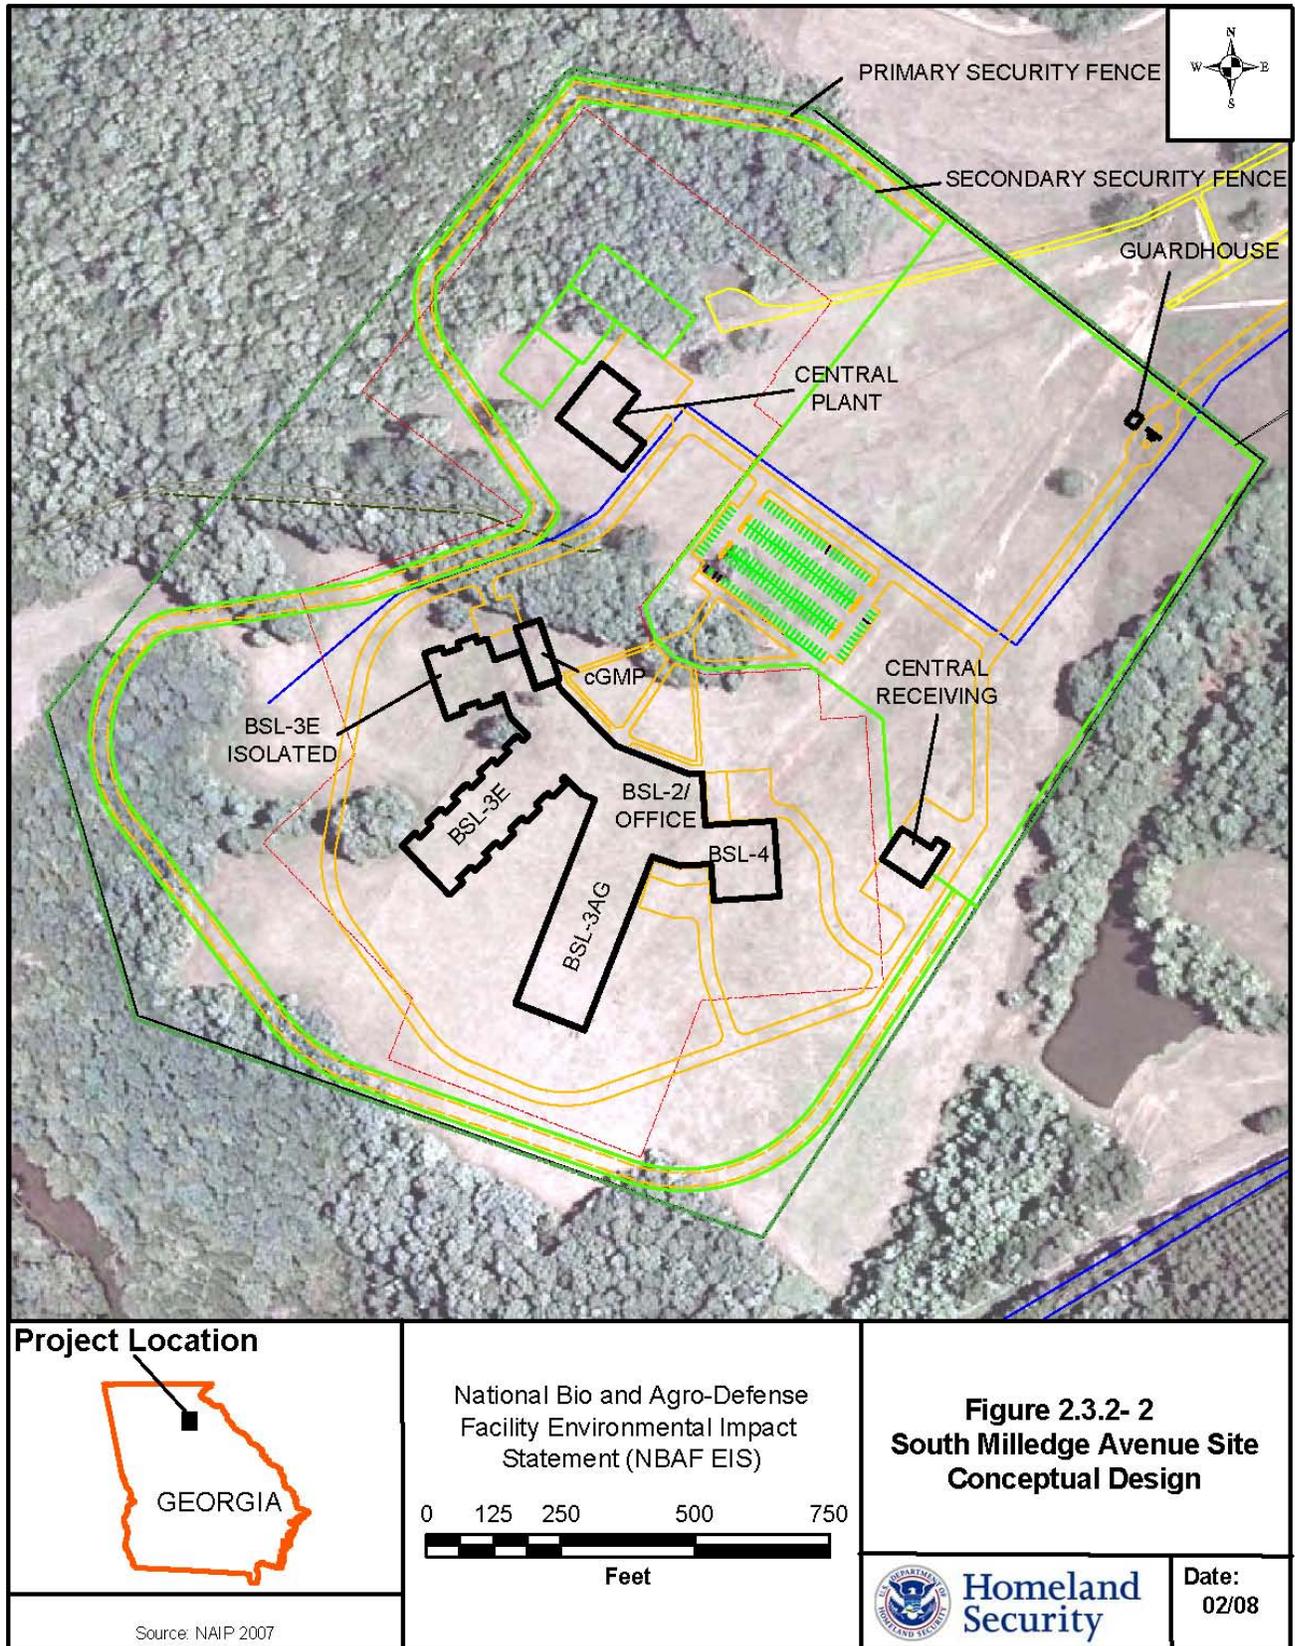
South Milledge Avenue Site Conceptual Design
